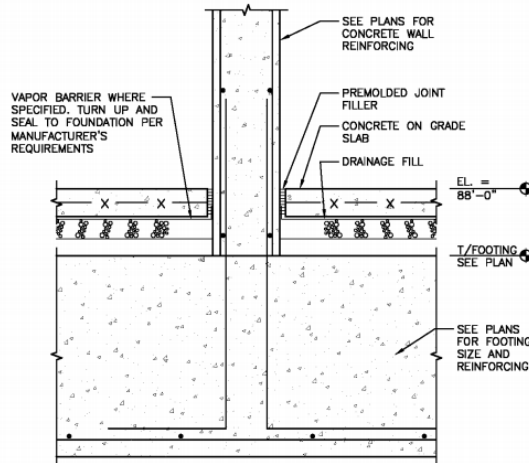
Concrete Wall Footing Section (S12.01, Drawing 14)
